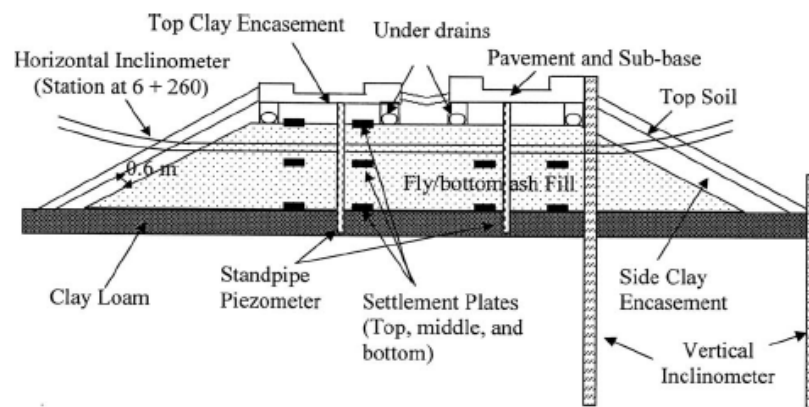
Cross section of an embankment at State Road 641, Terre Haute, Indiana - Sungmin Yoon et al. 2009
